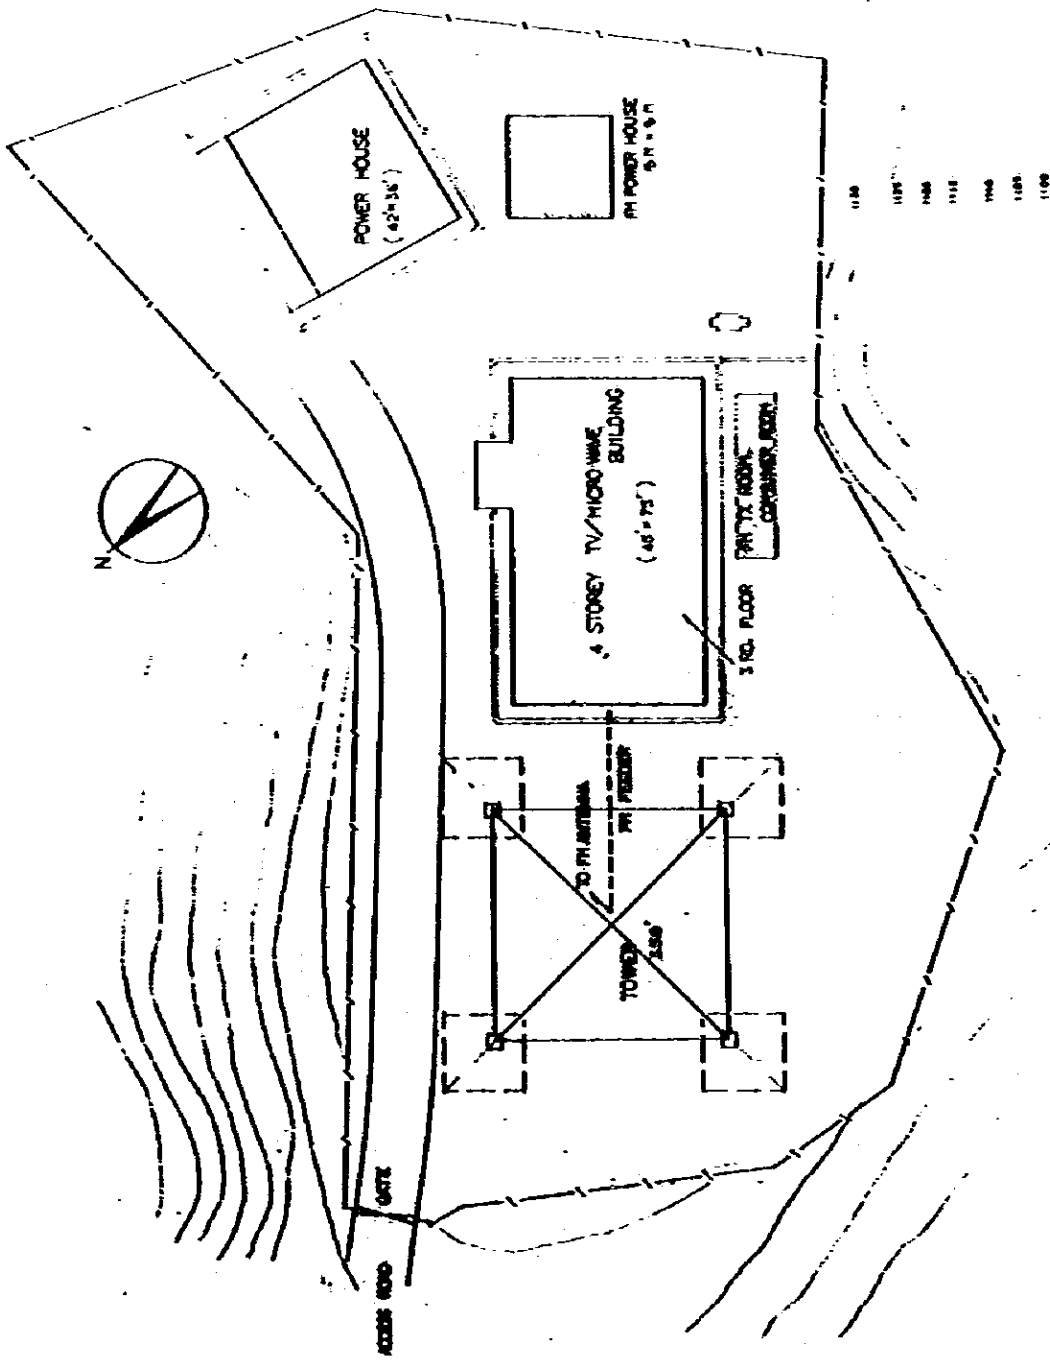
Site Plan - Bt. Tinggi, Johor
